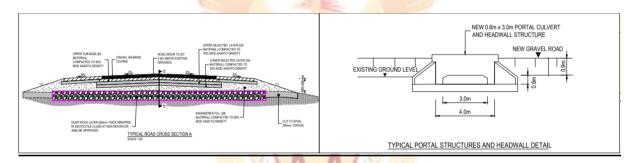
Cross section of the road crossing the Rietspruit (left) and detail of proposed portal culverts (right).
